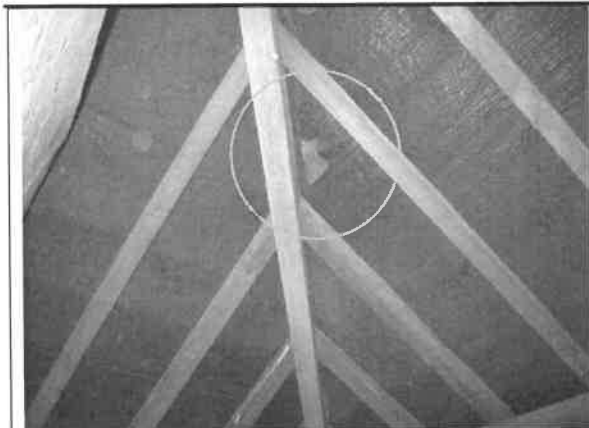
Minor damage at undertile roof felt with droppings beneath (possible roof void / roost access point to Roost 2)
